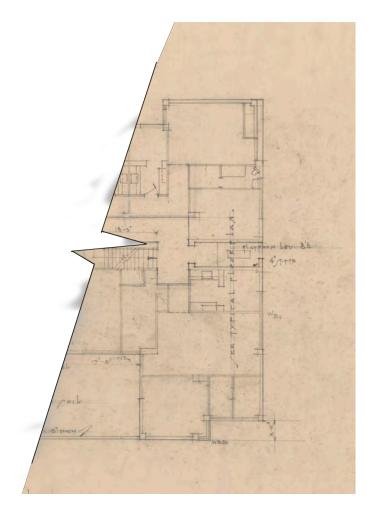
Clip of Original Floor Plan (schematic sketch) showing units on west side of the building.
